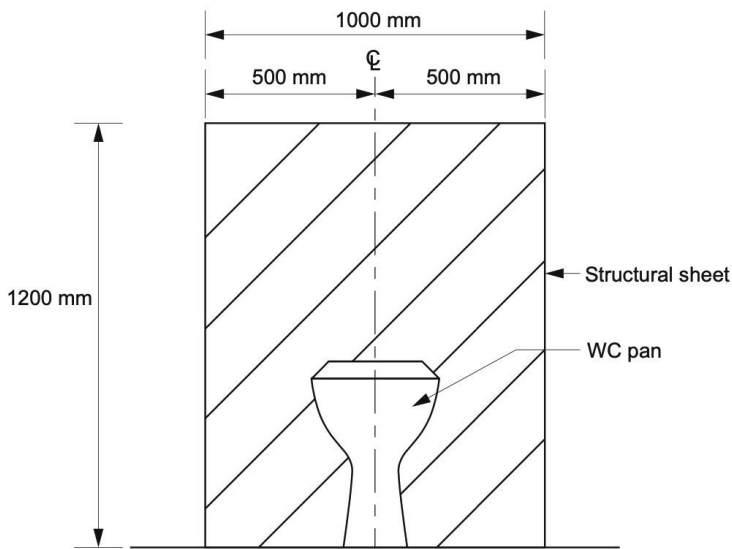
Location of sheeting for a wall behind a toilet pan
